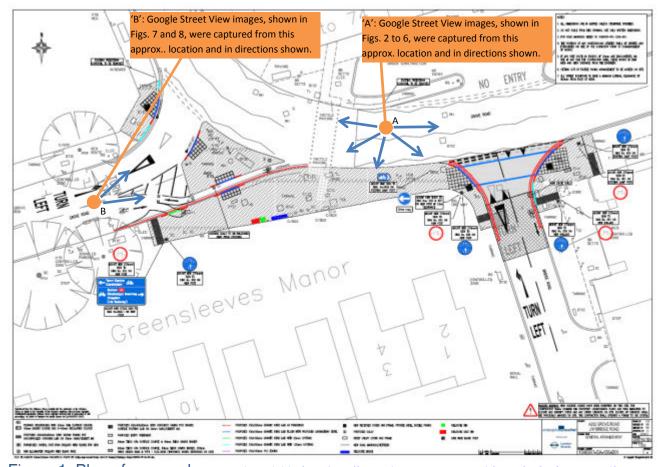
Plan of proposals: original available from http://suttonlivingstreets.org.uk/2013/02/26/groveroad/ Source: TfL https://consultations.tfl.gov.uk/cycling/a232groveroad accessed 21 January 2013 with additional labels by author
